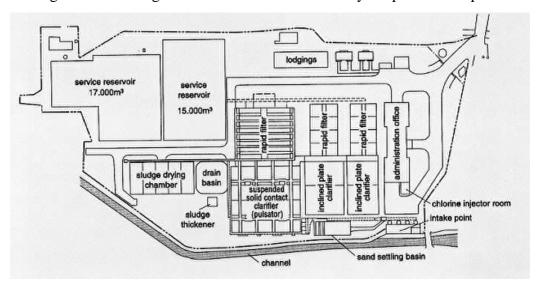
Plan of No. 1 Fon-yuan purification plant
